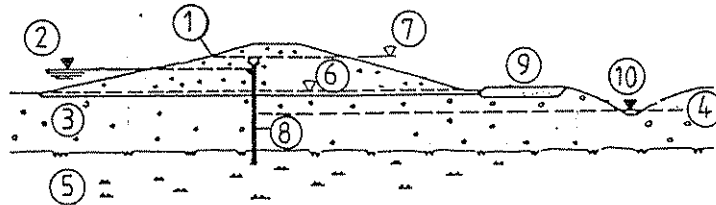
Slot diaphragm as an impervious barrier in river dike and foundation (adapted from BAWAG 1986).
